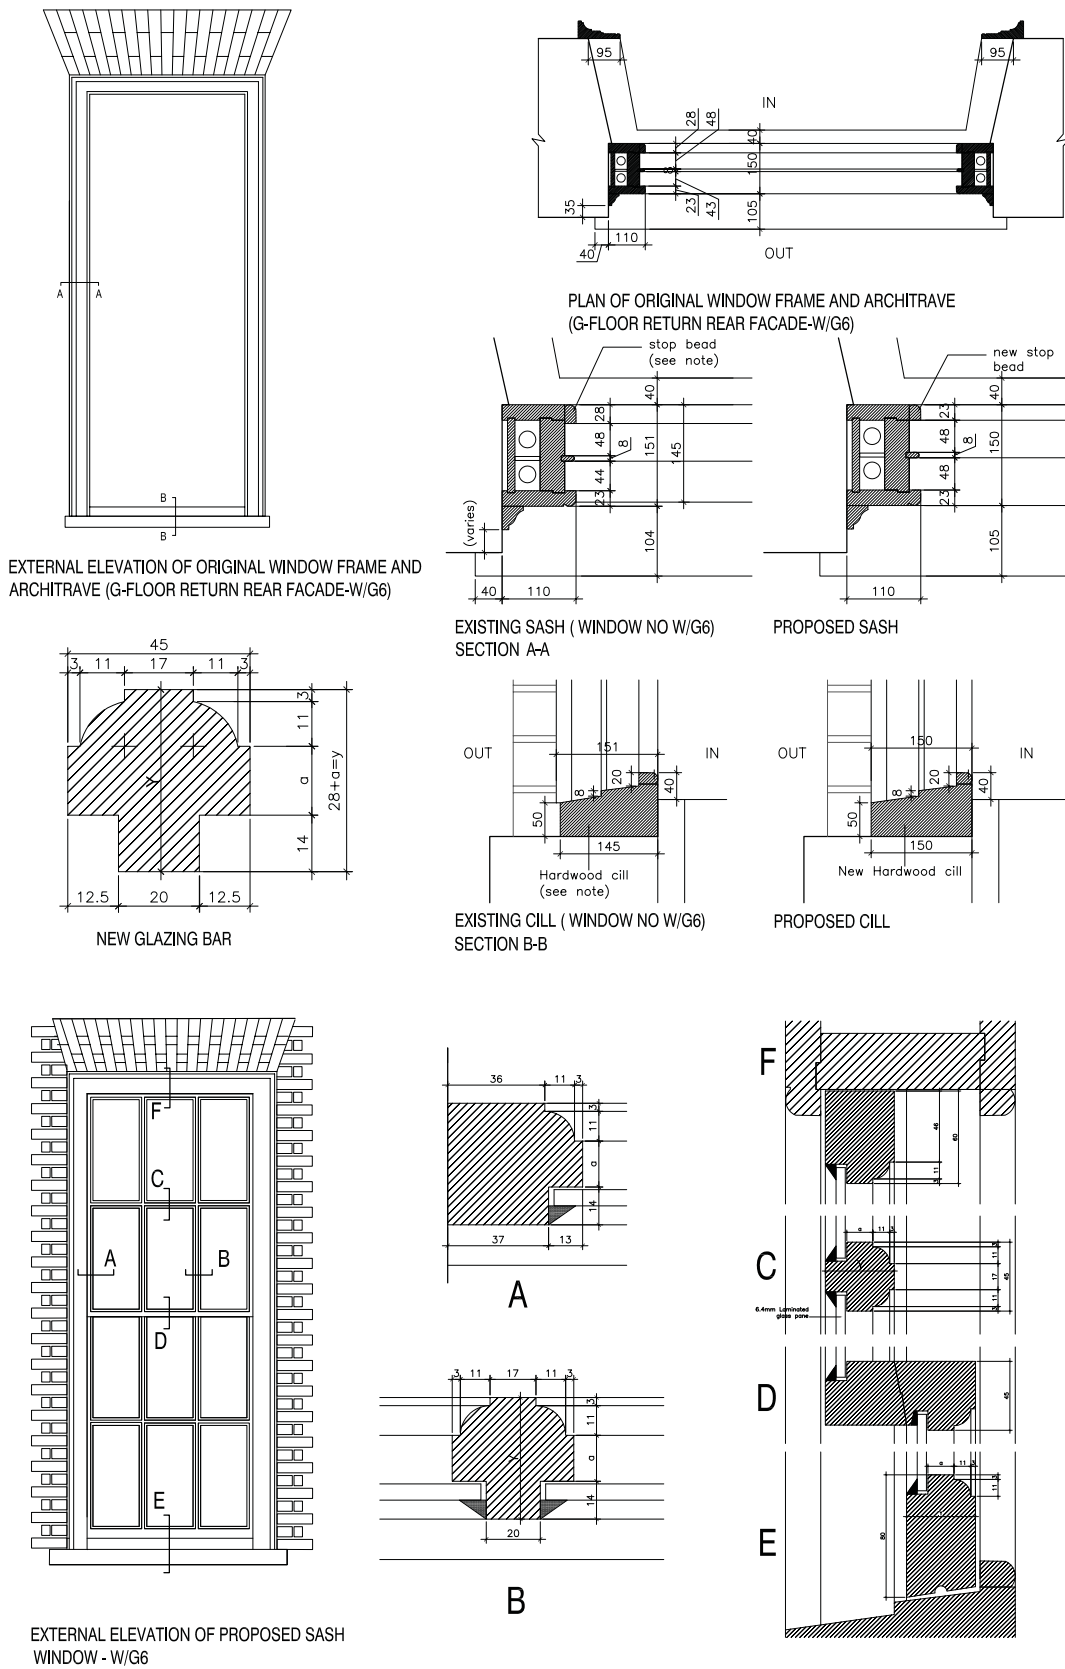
Drawings showing original box frame and architrave at ground floor level and proposed new sash window detailing throughout ('a' and 'Y' on the New Glazing Bar section refer to the diminishing thickness of the wall at higher levels which affected the depths of both glazing bars and box frames)
